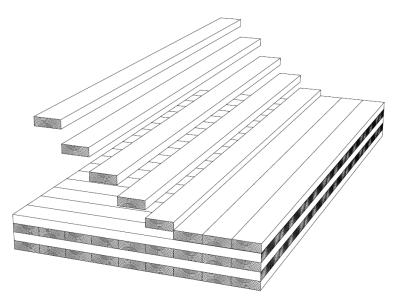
Arrangement of timber laminates in cross-laminated timber panels.
